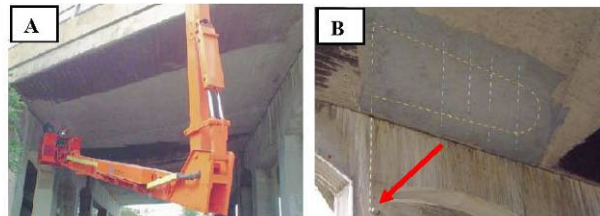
A: Example of galvanizing compound being applied under bridge deck; B: Galvanizing compound applied with current collecting wires highlighted; small junction box is visible (arrow) (St. Paul, MN Bridge Deck).
